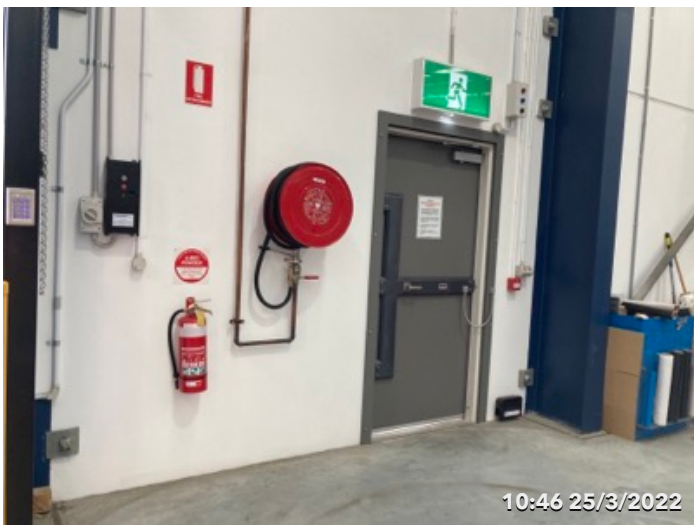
Fire safety gears and vermin trap were set up every warehouse door
